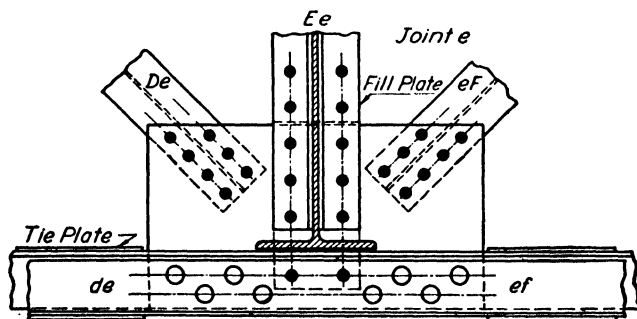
TRUSS JOINT *c* AND CHORD SPLICE.
